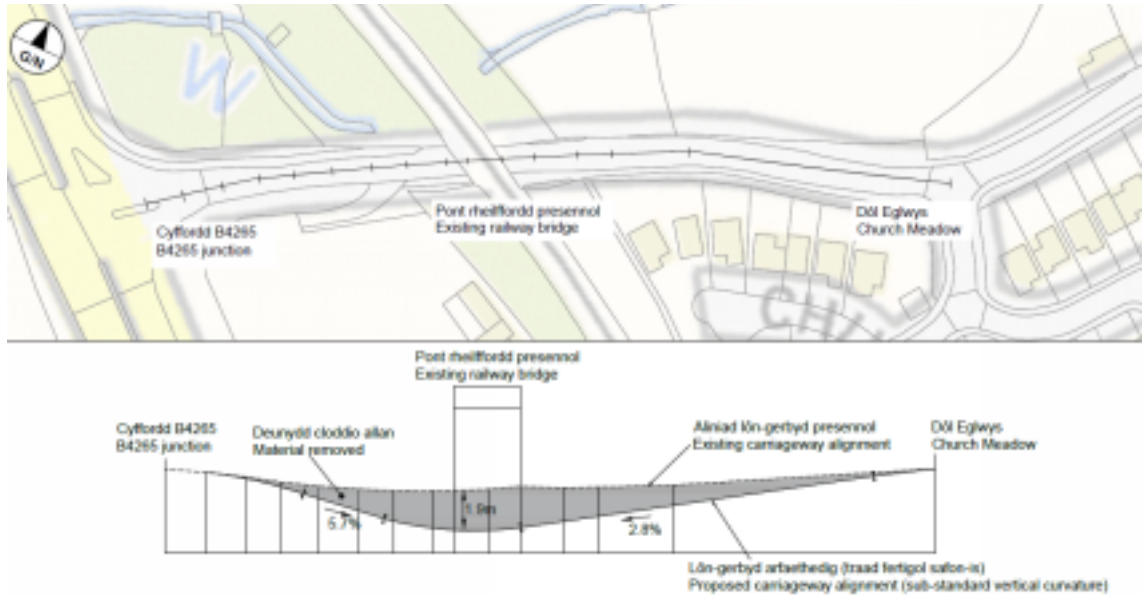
Existing Railway Bridge Existing (top) and Proposed (bottom)
